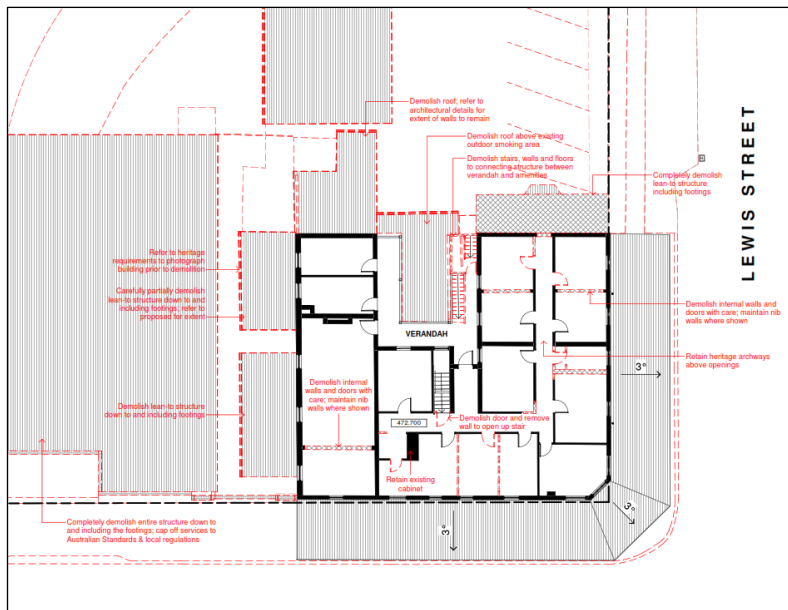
Approved Federal Hotel First Floor Demolition Plan, see Dwg No. DA 091
